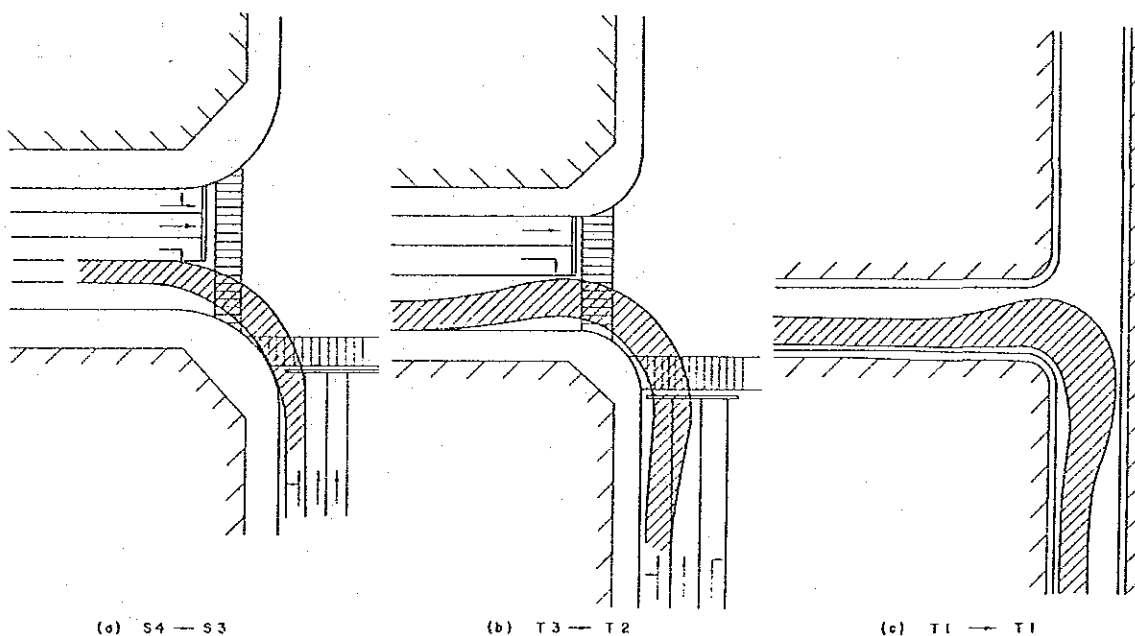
Examples of Passage Method at an At-grade Intersection
